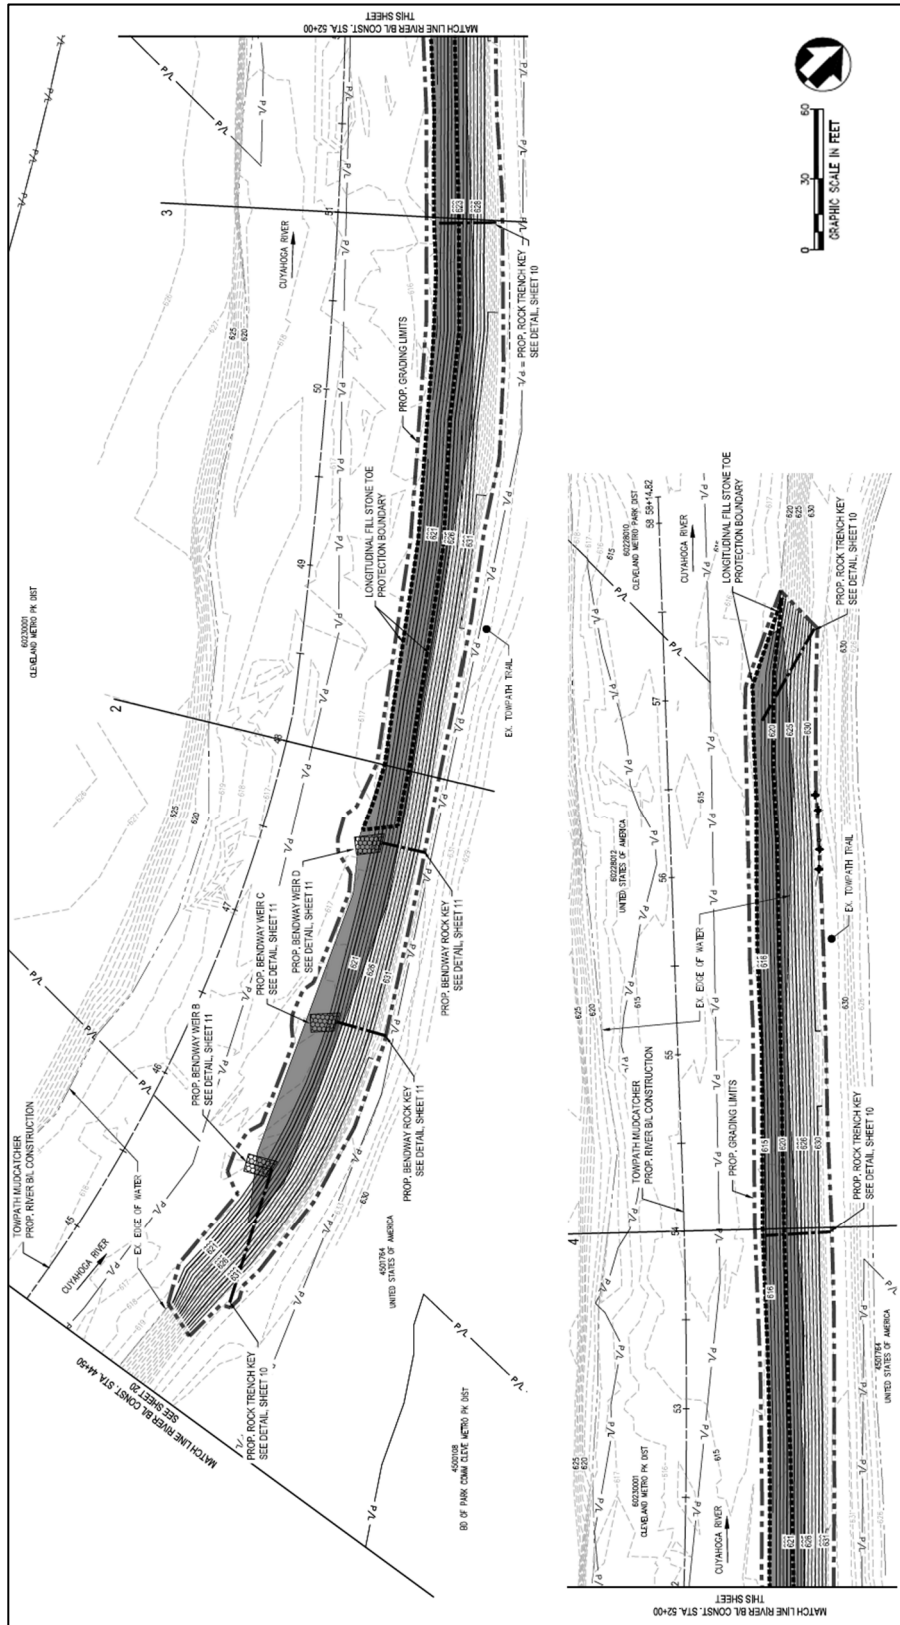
Towpath Trail: Mudcatcher: Proposed Grading Plan (from Sheet 21 of the Drawings)
